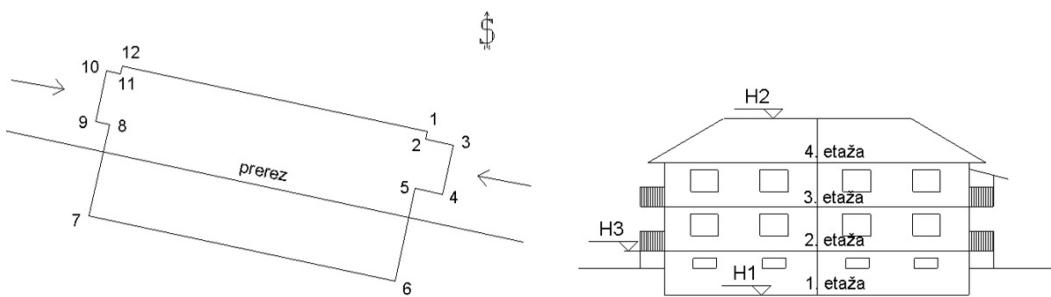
The current building exterior registration in the Building Cadastre: building ground plan (left) and building cross section drawing (right) (Surveying and Mapping Authority of the Republic of Slovenia).
